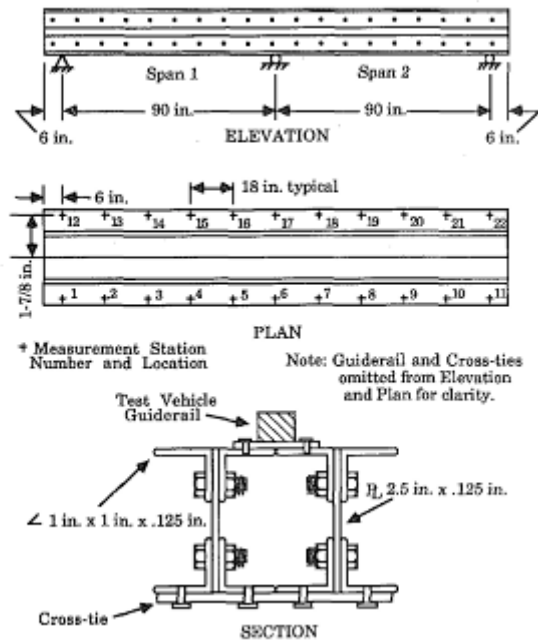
Model bridge girder details (Mazurek and De Wolf, 1990).
